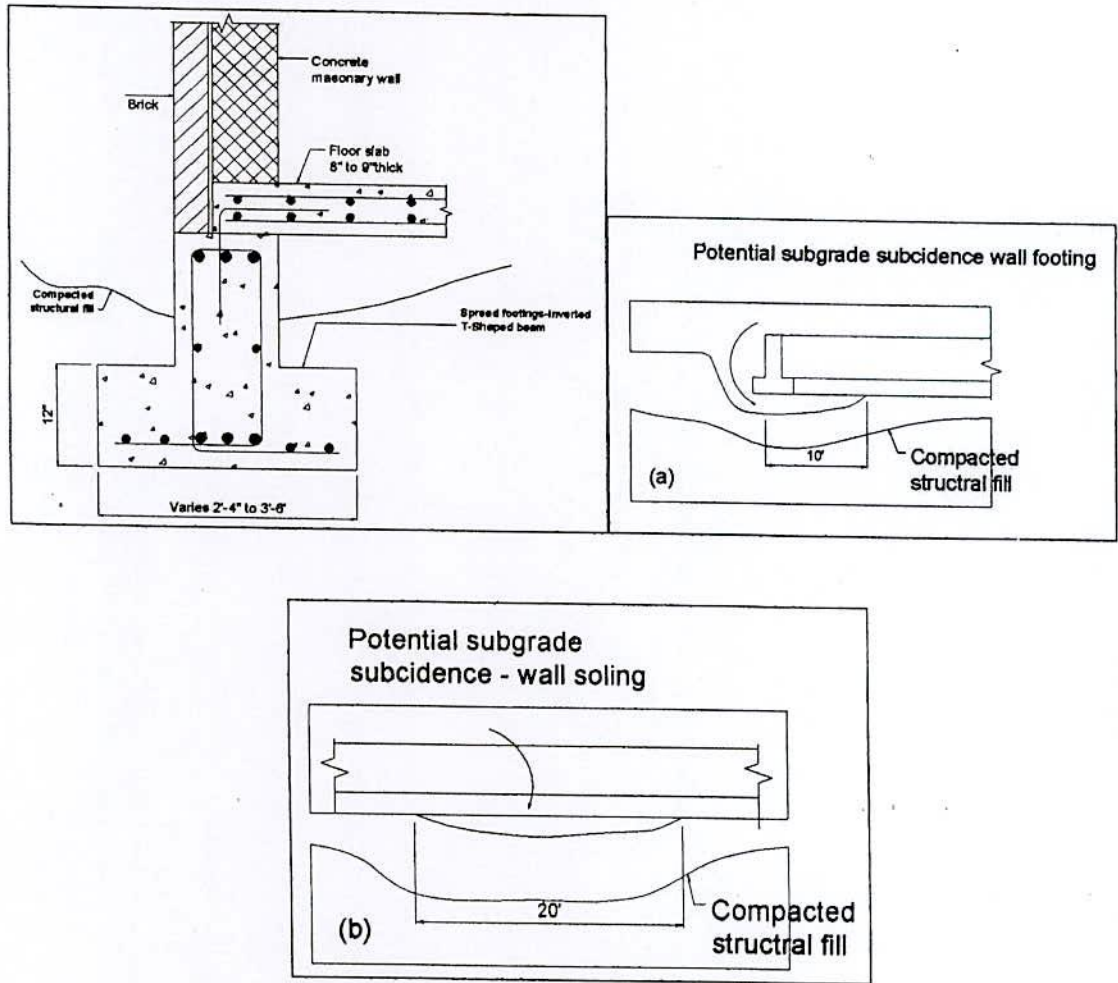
"T" shaped grade beams footings (after Wu & Scheessele, 1982).
